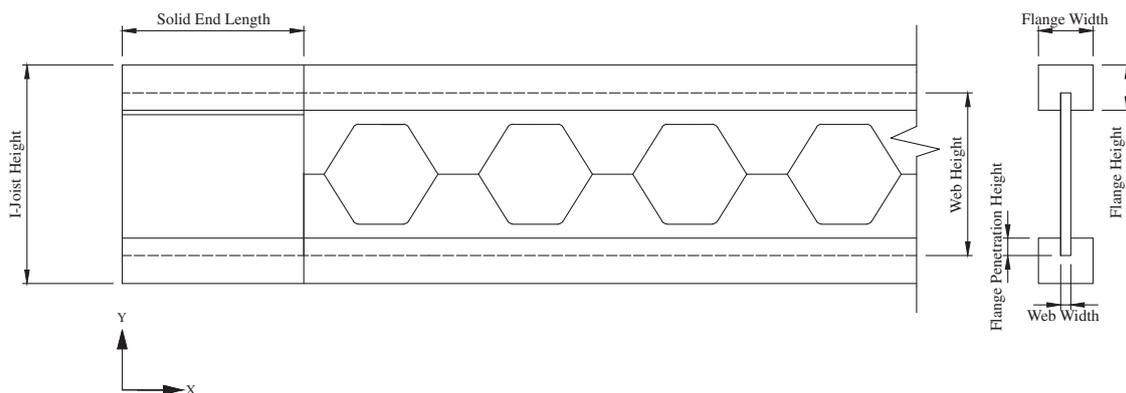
Longitudinal section and cross section of castellated I-joist with geometric parameters.
